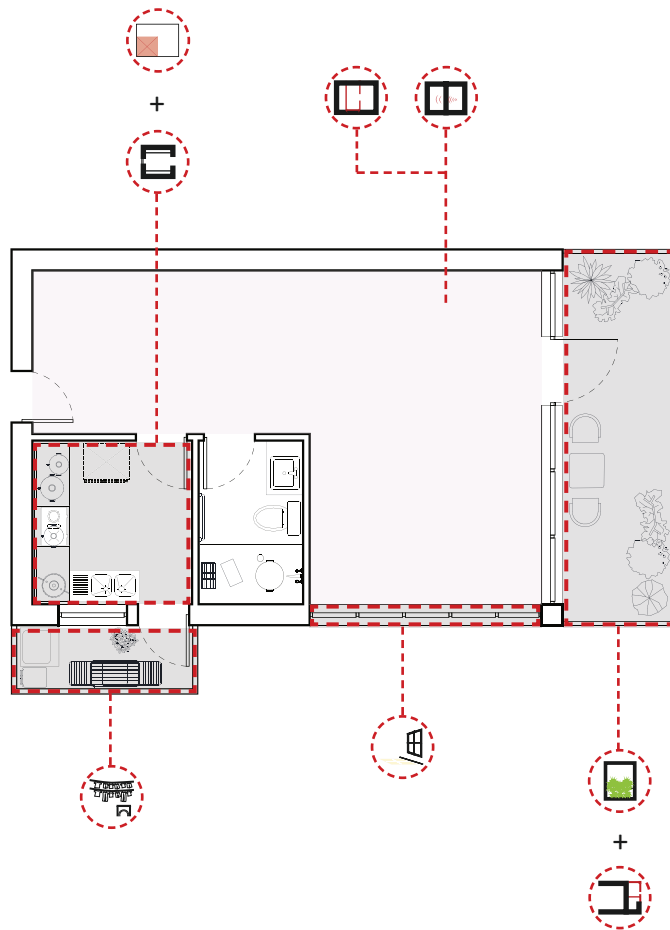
Adaptable and traditional elements marked in a one bed apartment plan (Above)
